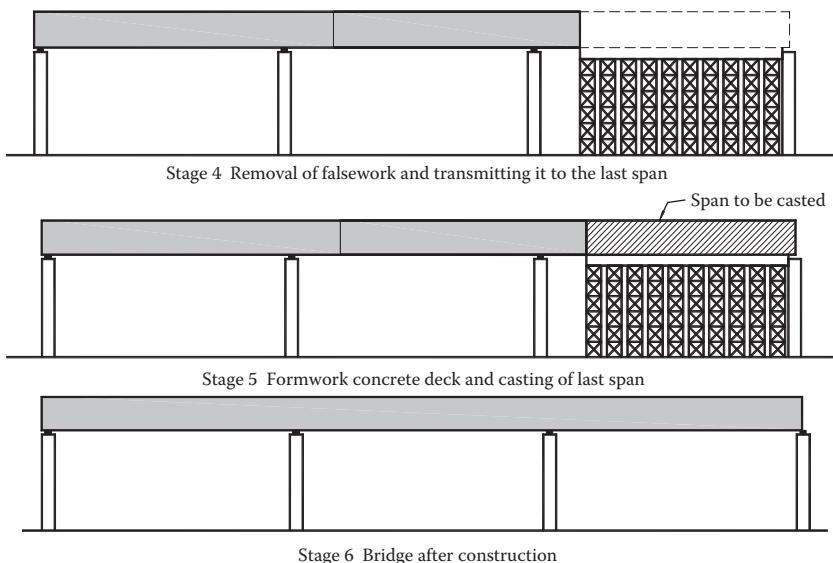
(Continued) Construction stages using stationary formwork.
